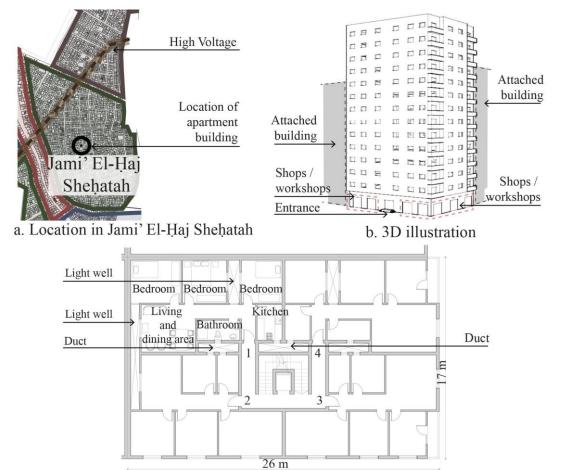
Apartment building: (a) Location in Jami' El-Haj Shehatah area, (b) 3D illustration, (c) typical plan with one furnished residence.
